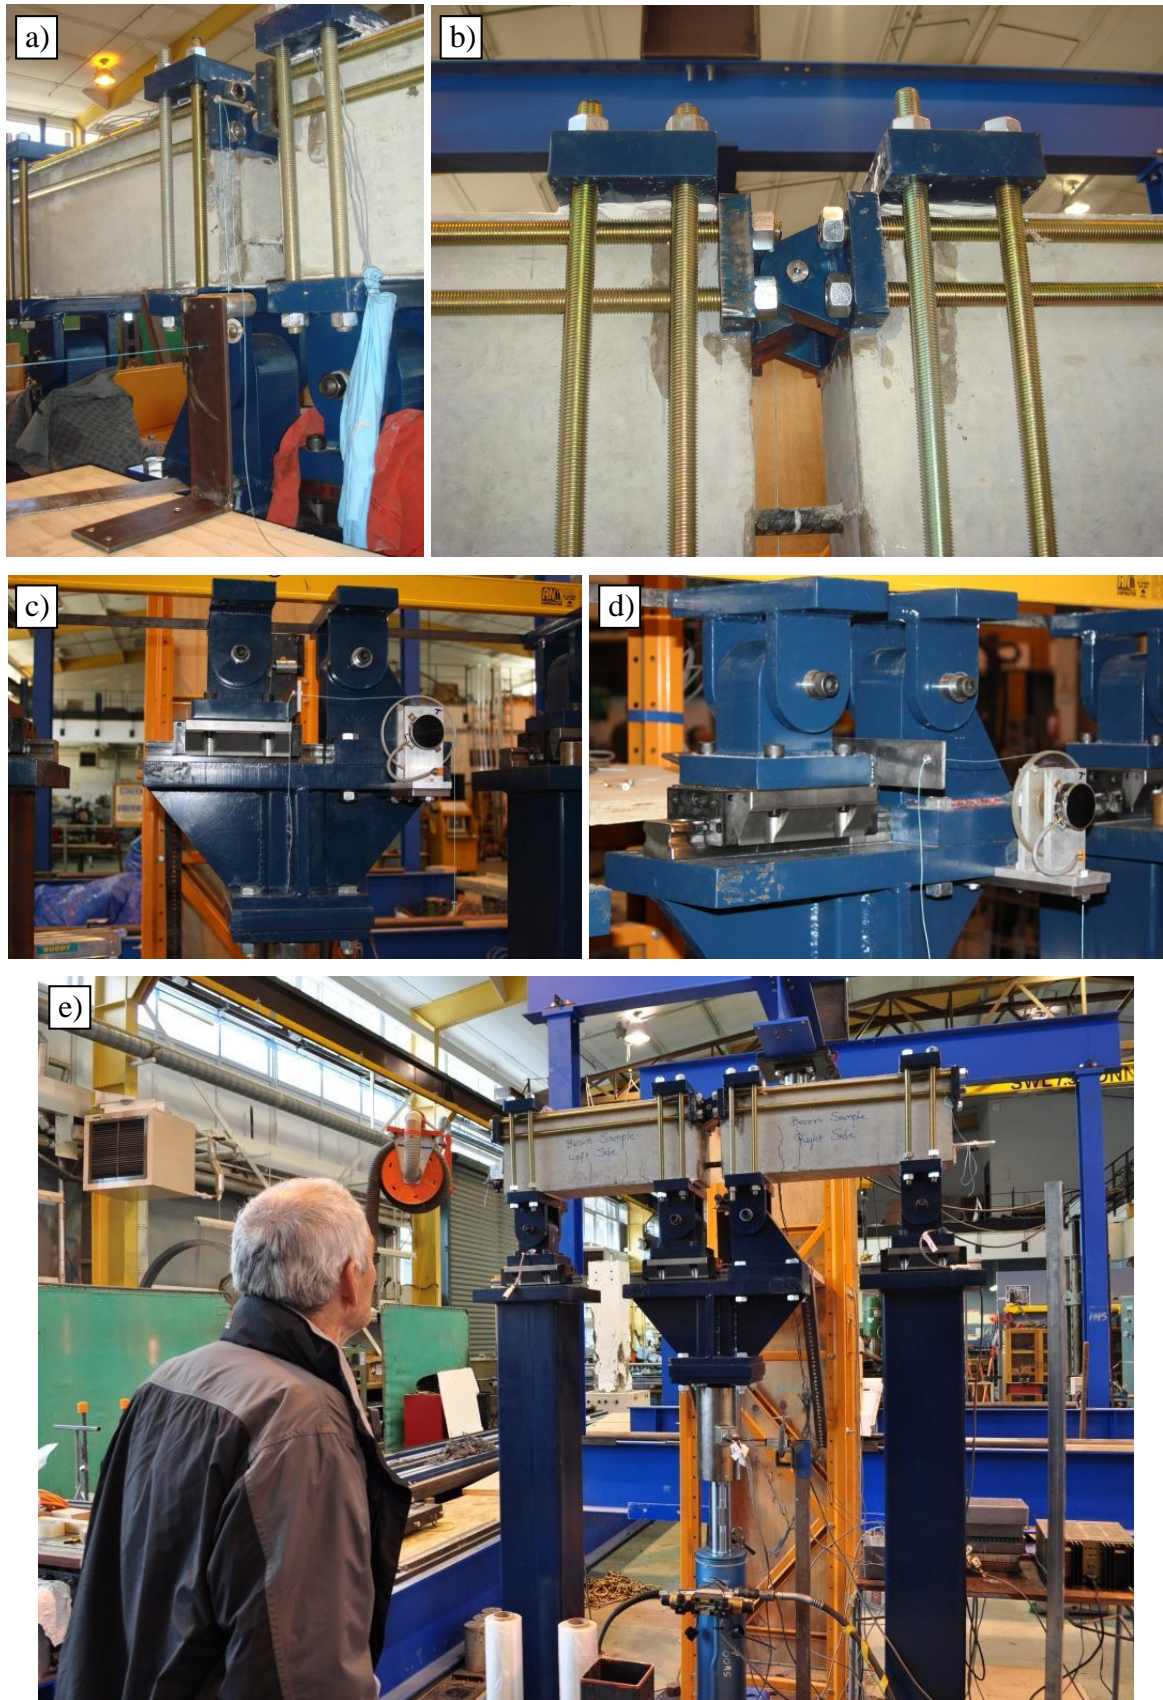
Beam bending test setup; central deflection measurement (a), steel hinge and beam clamping mechanisms (b), loading head and lateral movement measurement (c, d), and complete test setup (e)
